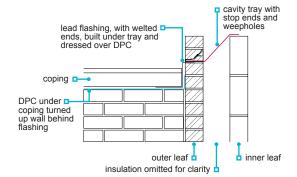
Parapet to external wall junction — DPC/cavity tray arrangement
